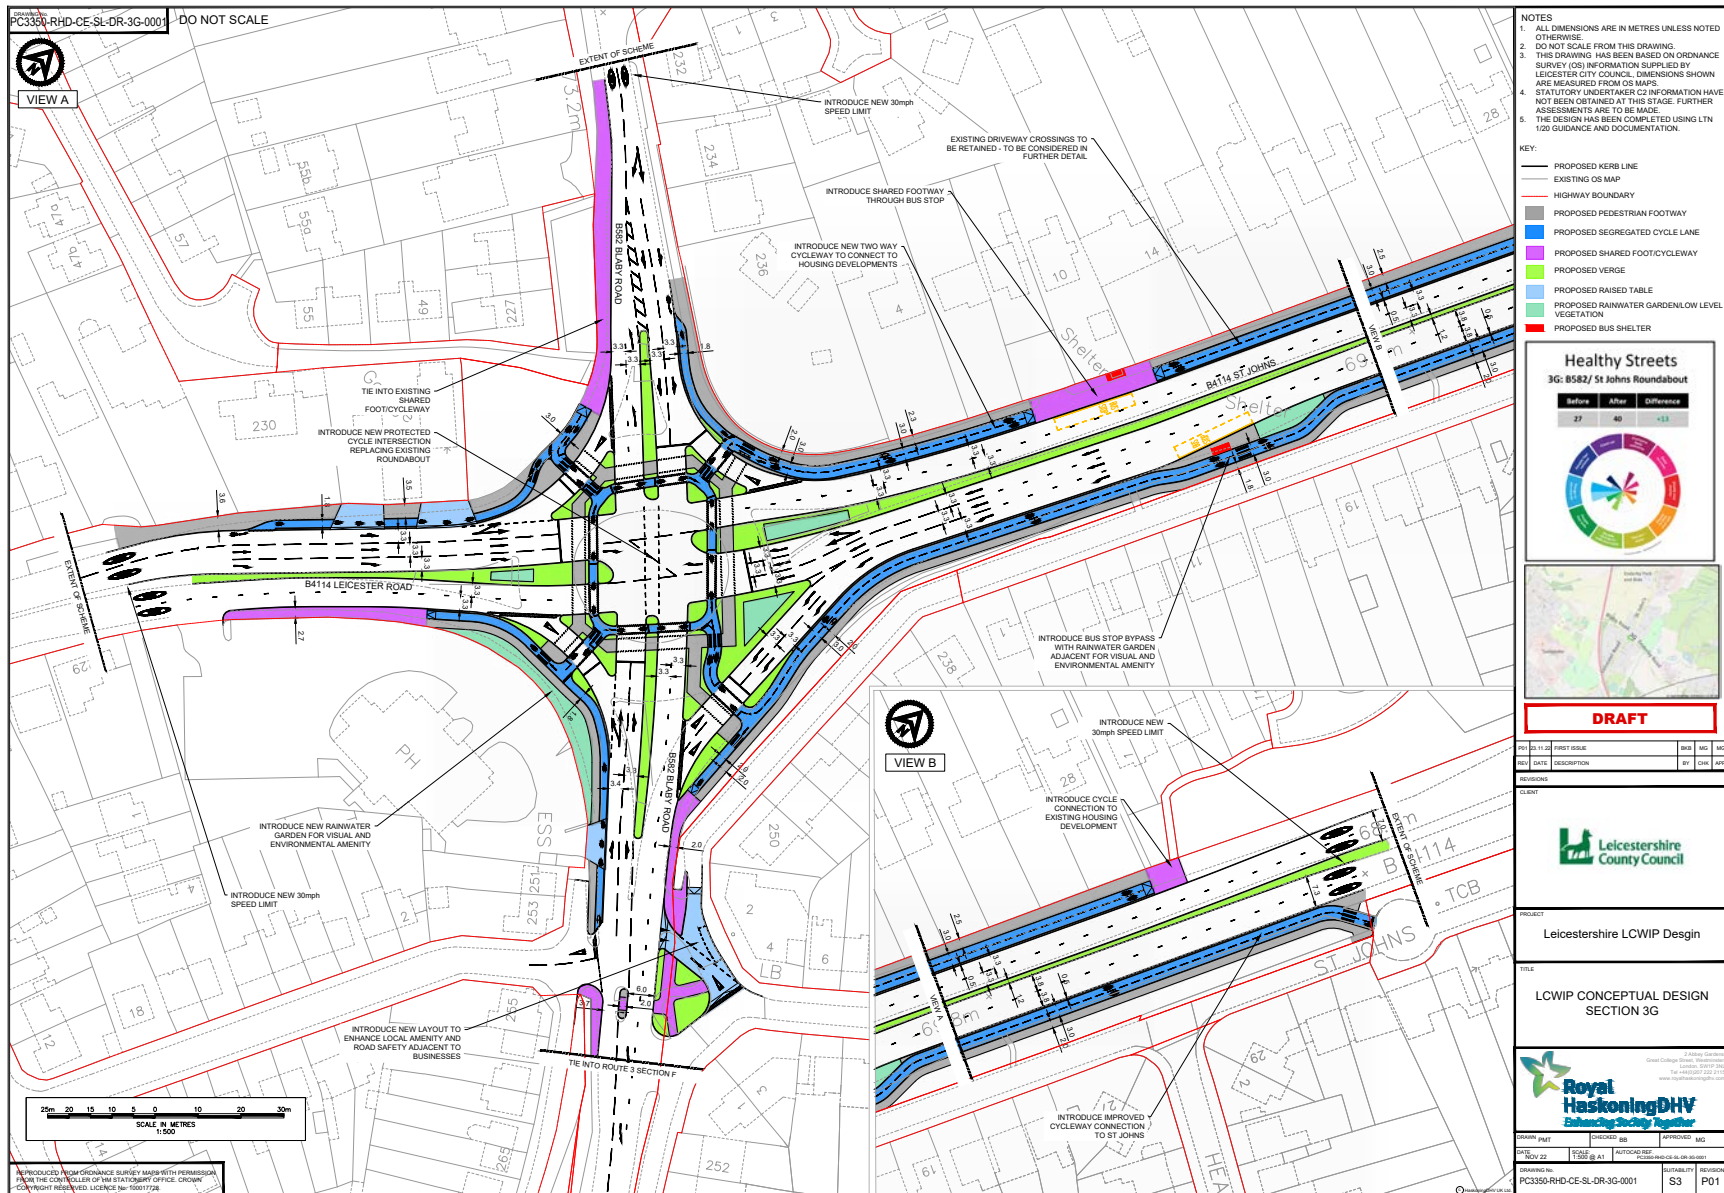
Concept design for route section 3G (Foxhunter roundabout)
